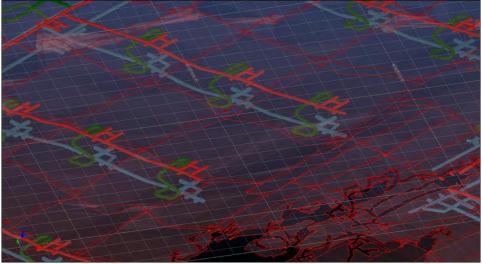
Schematic Detail of Mine Planning Layout (Cabanasses)
